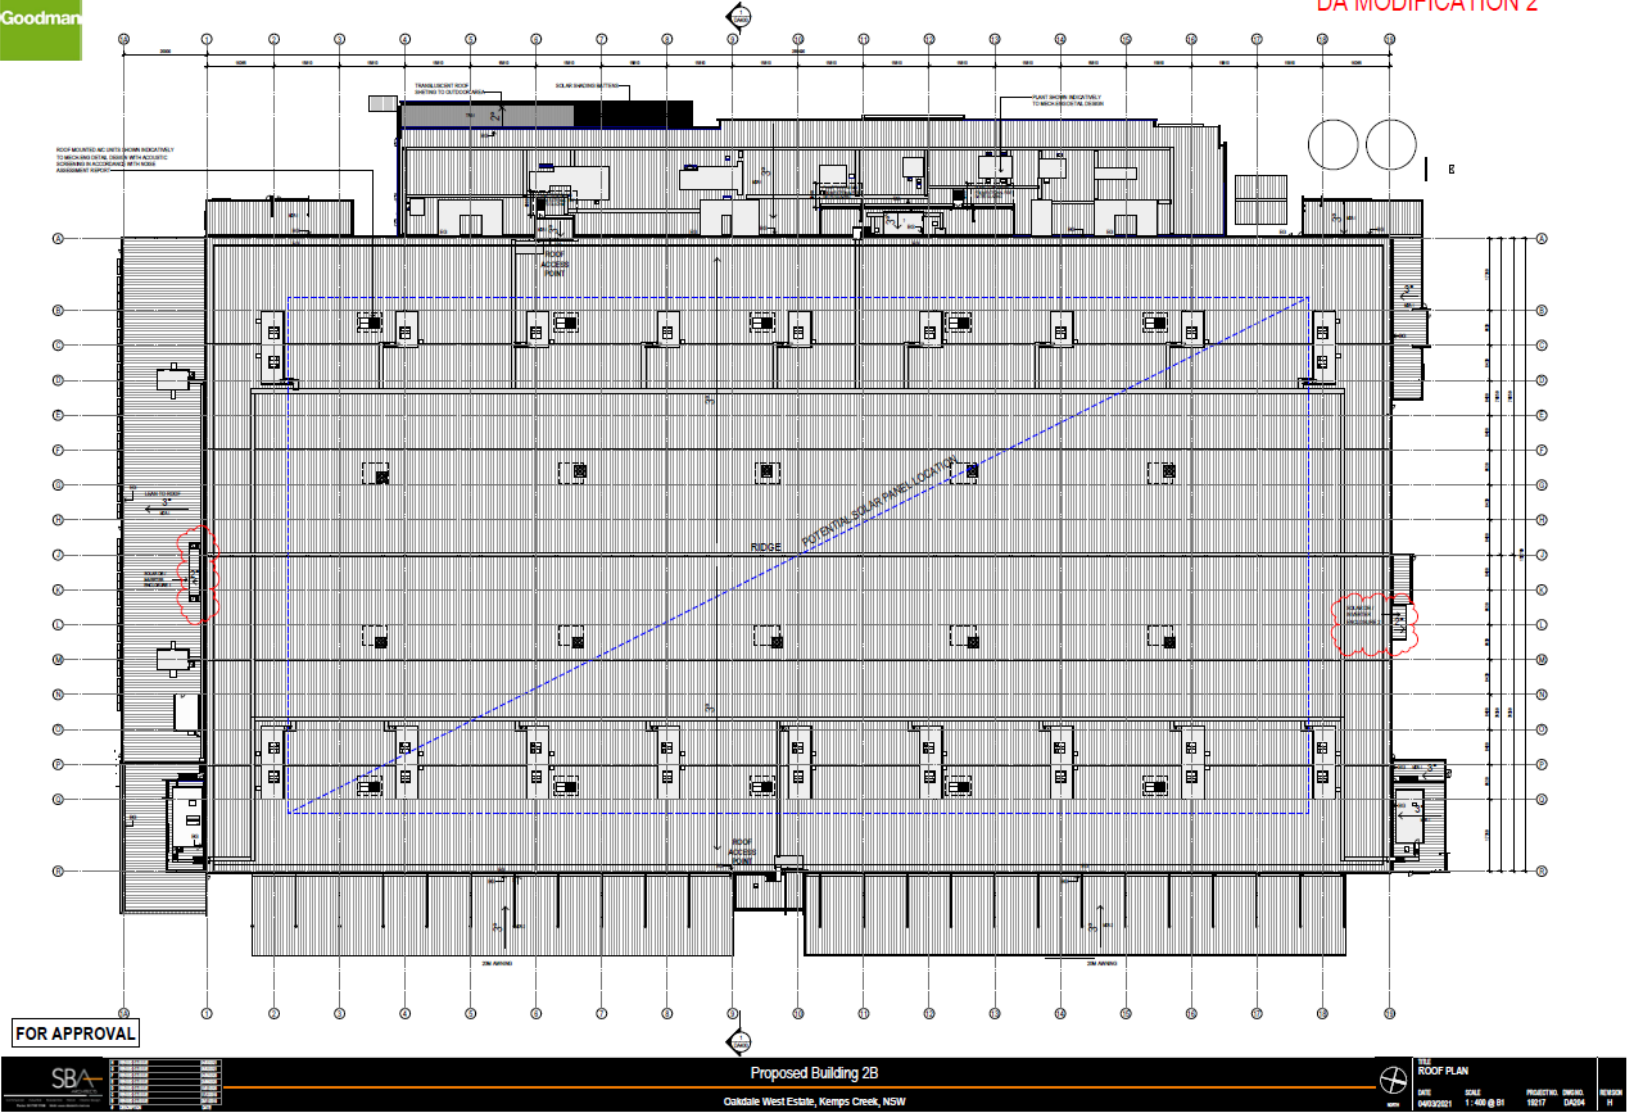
Roof Plan (Mod 2 – Plan 3 of 4)
